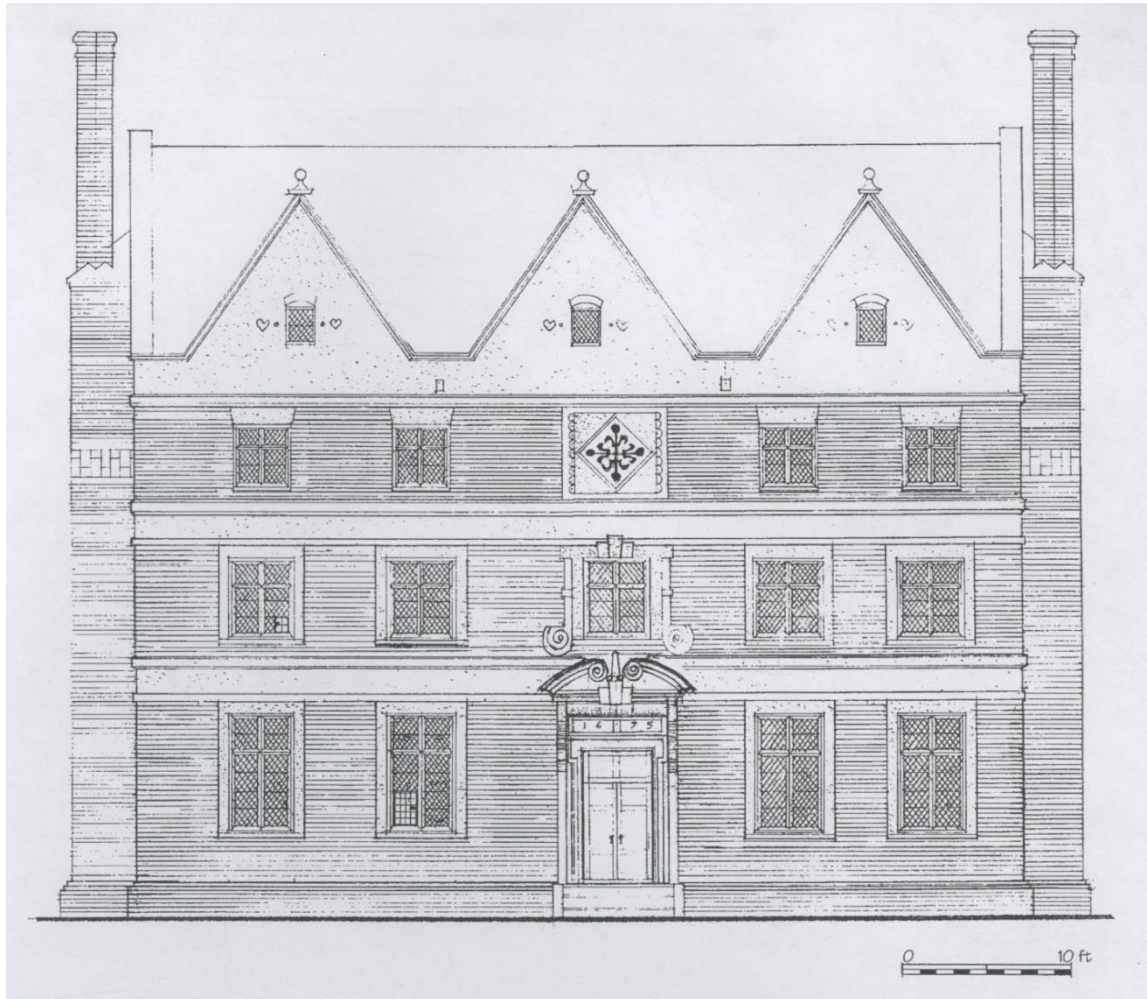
Conjectural elevation drawing of Arlington, Northampton County, built c. 1670. From Luccetti et al., *Archaeology at Arlington*, 28.
